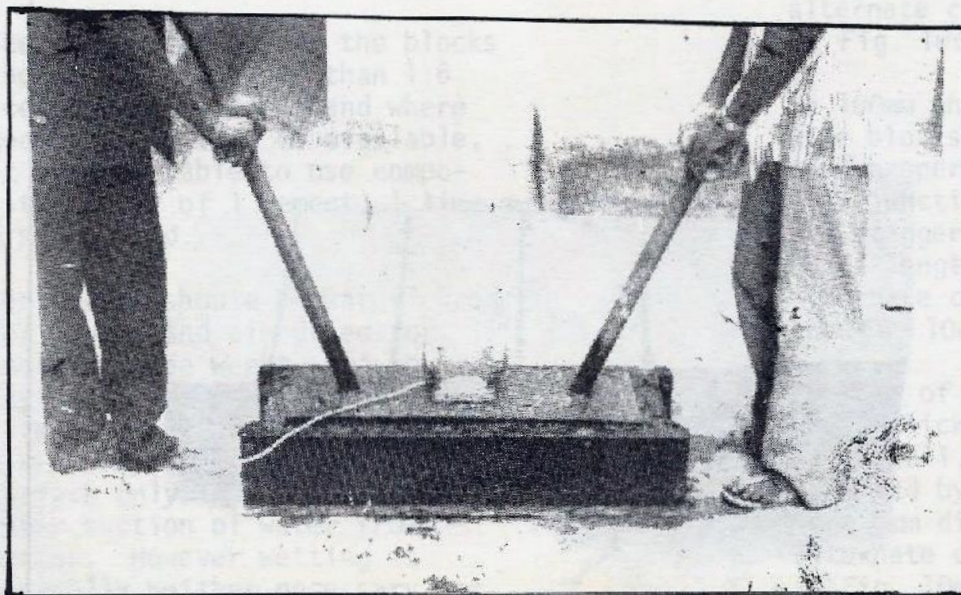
STONECRETE BLOCKS BEING COMPACTED IN A MOULD WITH A PLATE VIBRATOR
